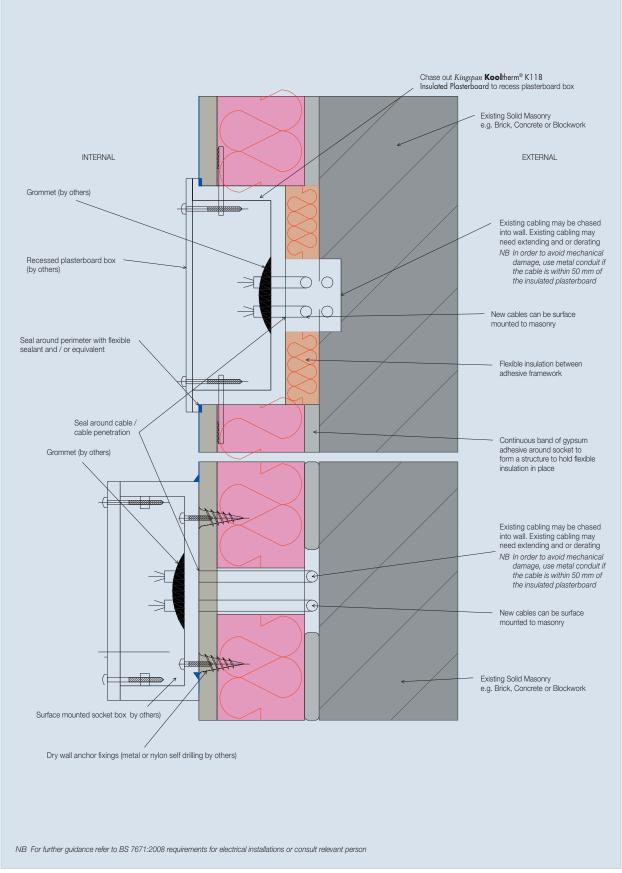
Recessed or Surface Mounted Socket Detail (Adhered)
